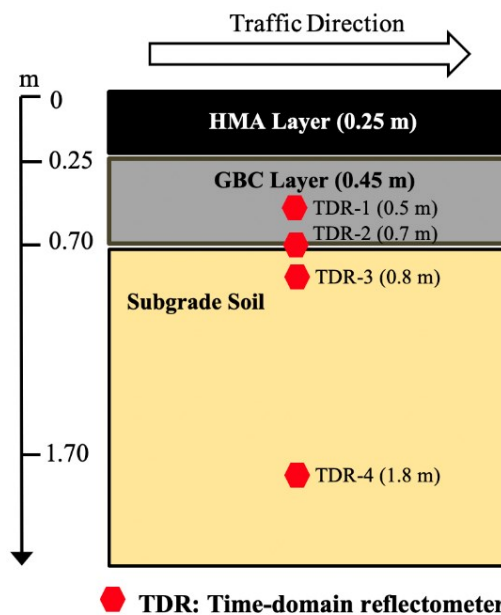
Cross-section of pavement layers and location of TDR embedded in the base and subgrade layers
